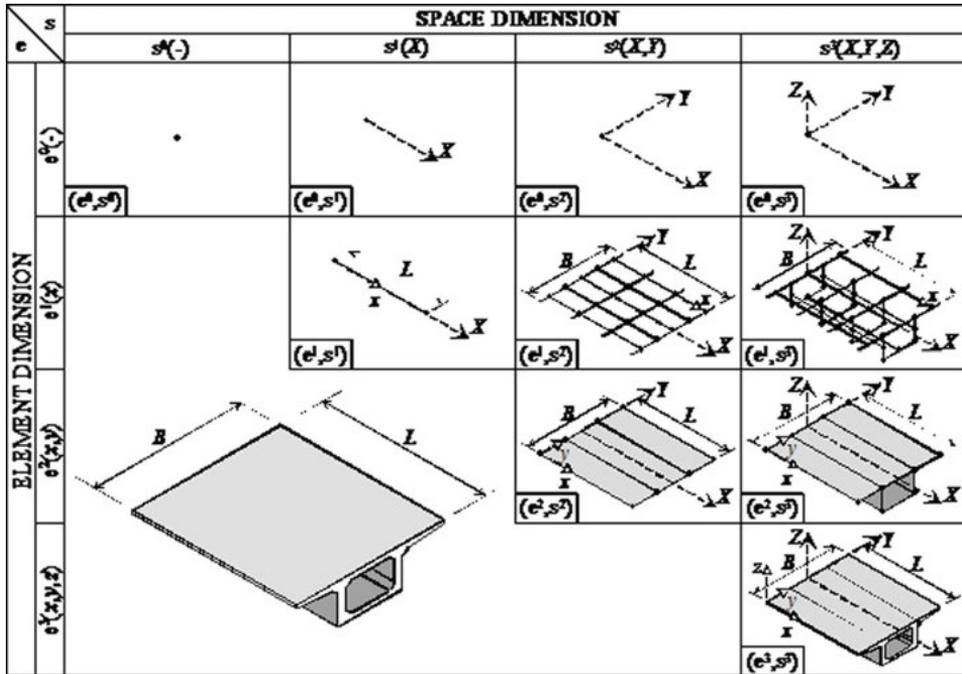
Taxonomy of bridge geometry models – examples of various models of bridge box girder [11]
